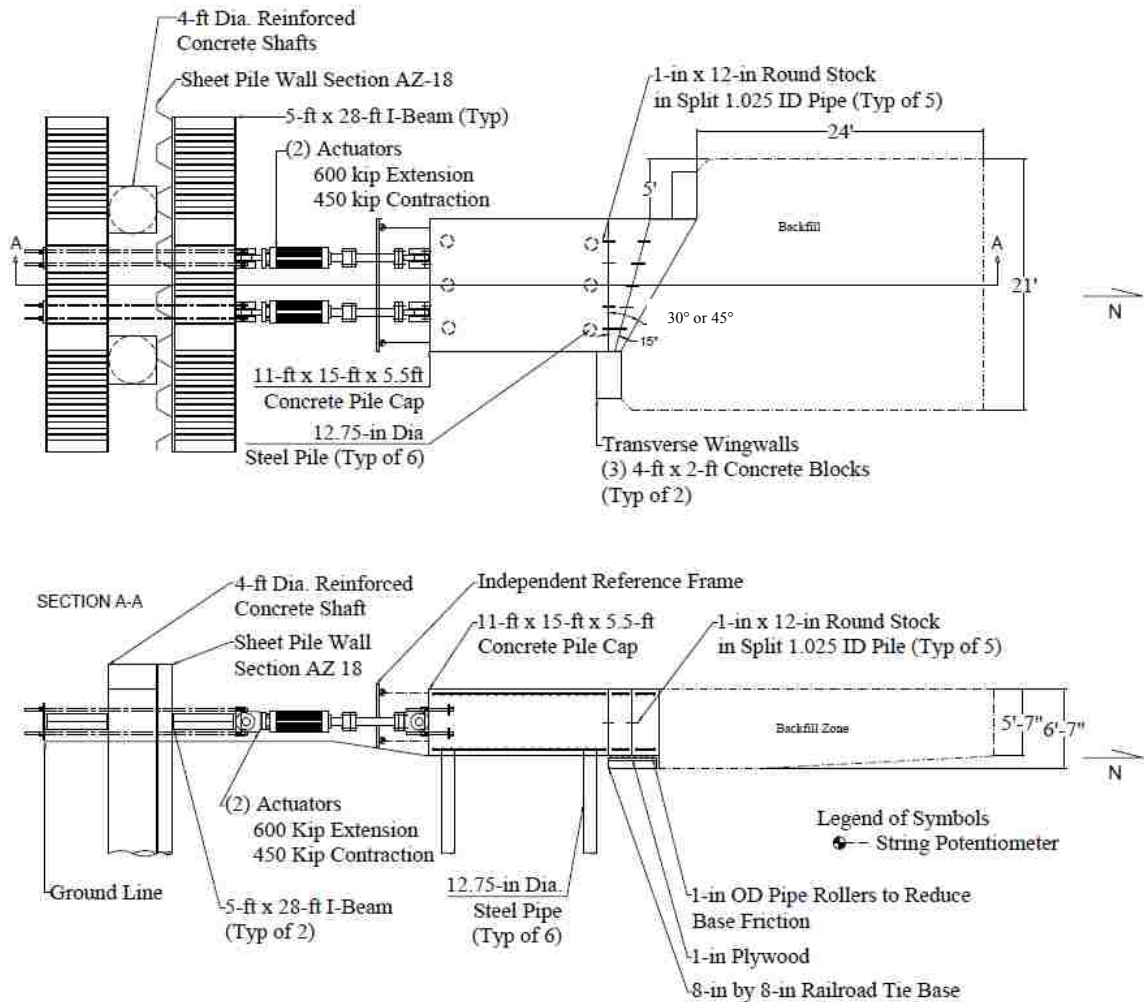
Schematic Drawing of Test Layout for Abutment with Reinforced Concrete Wingwalls.
